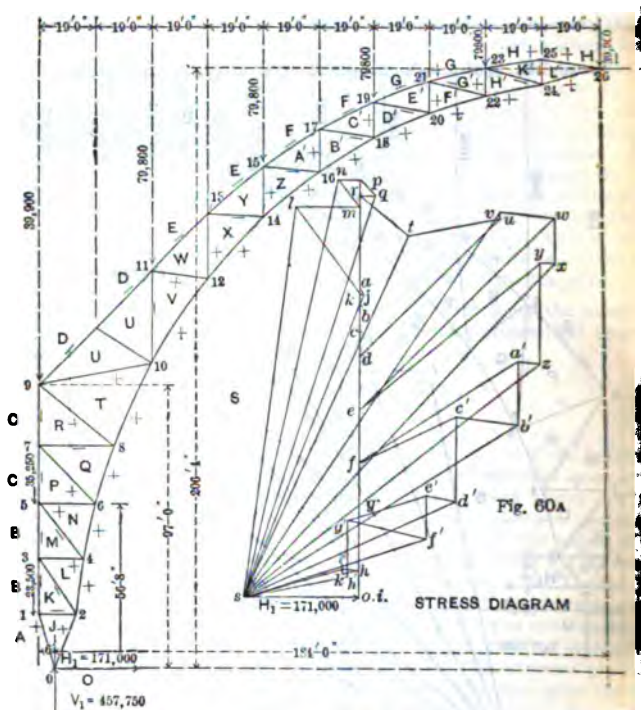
Liberal Arts Building, Chicago, Ill. Truss-diagram
